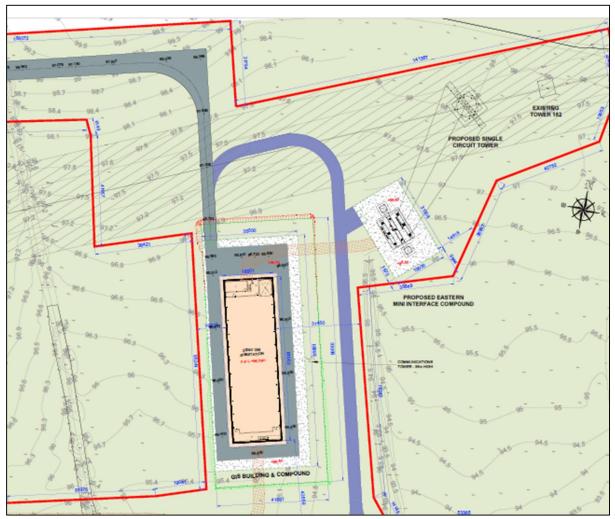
Eastern Connection (Pylon, Interface Compound Connecting GIS Substation to Existing Transmission System)
